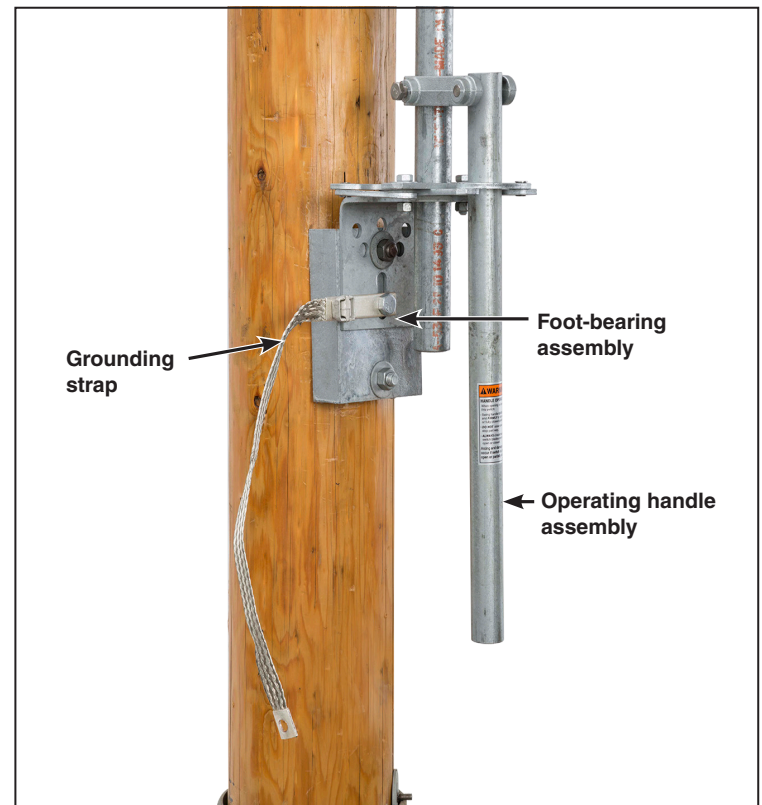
Install the foot-bearing assembly so the handle is 2 to 3 inches above the handle yoke.
